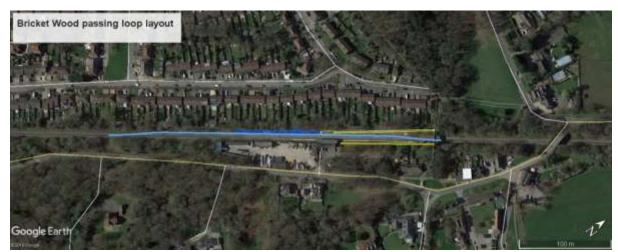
AERIAL MAP LAYOUT OF TWO-PLATFORM BRICKET WOOD SOLUTION
